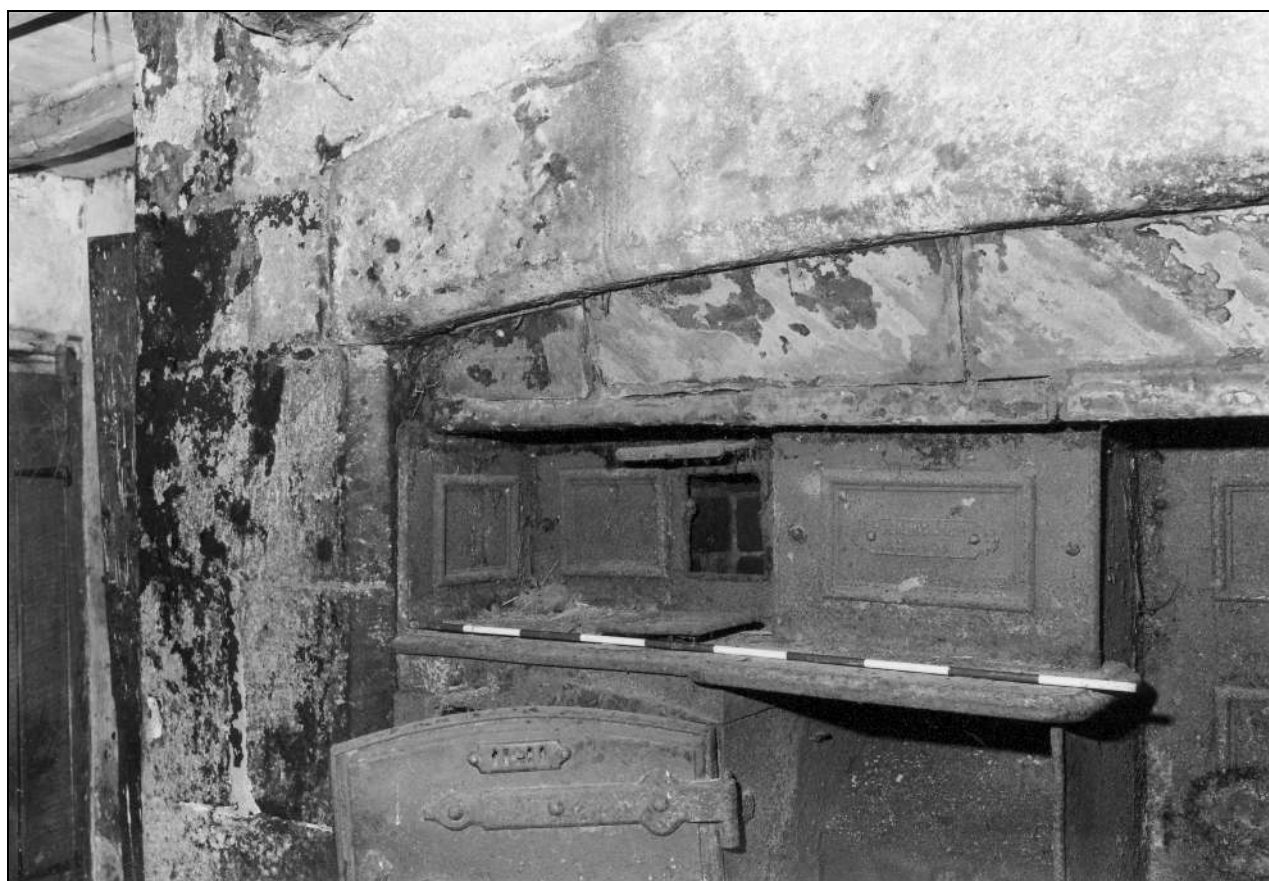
Detail of housebody fireplace with later arch (film 1, frame 15)
